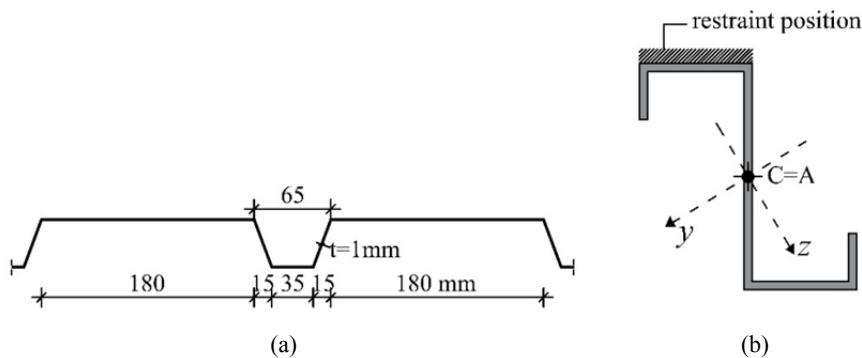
(a) Dimensions and (b) position of trapezoidal steel sheeting.
